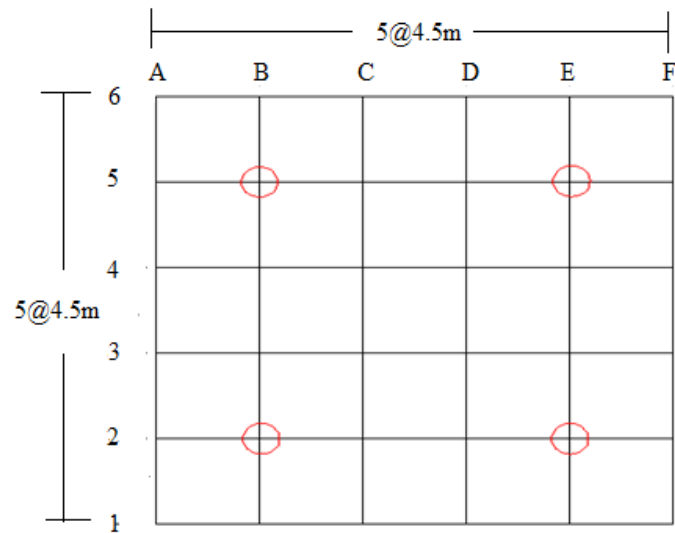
3 Plan view of building with column floated at parallel position of ground floor
